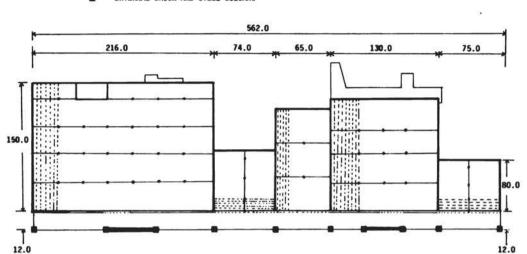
Framing plan of Northwood Village Shopping Center.
